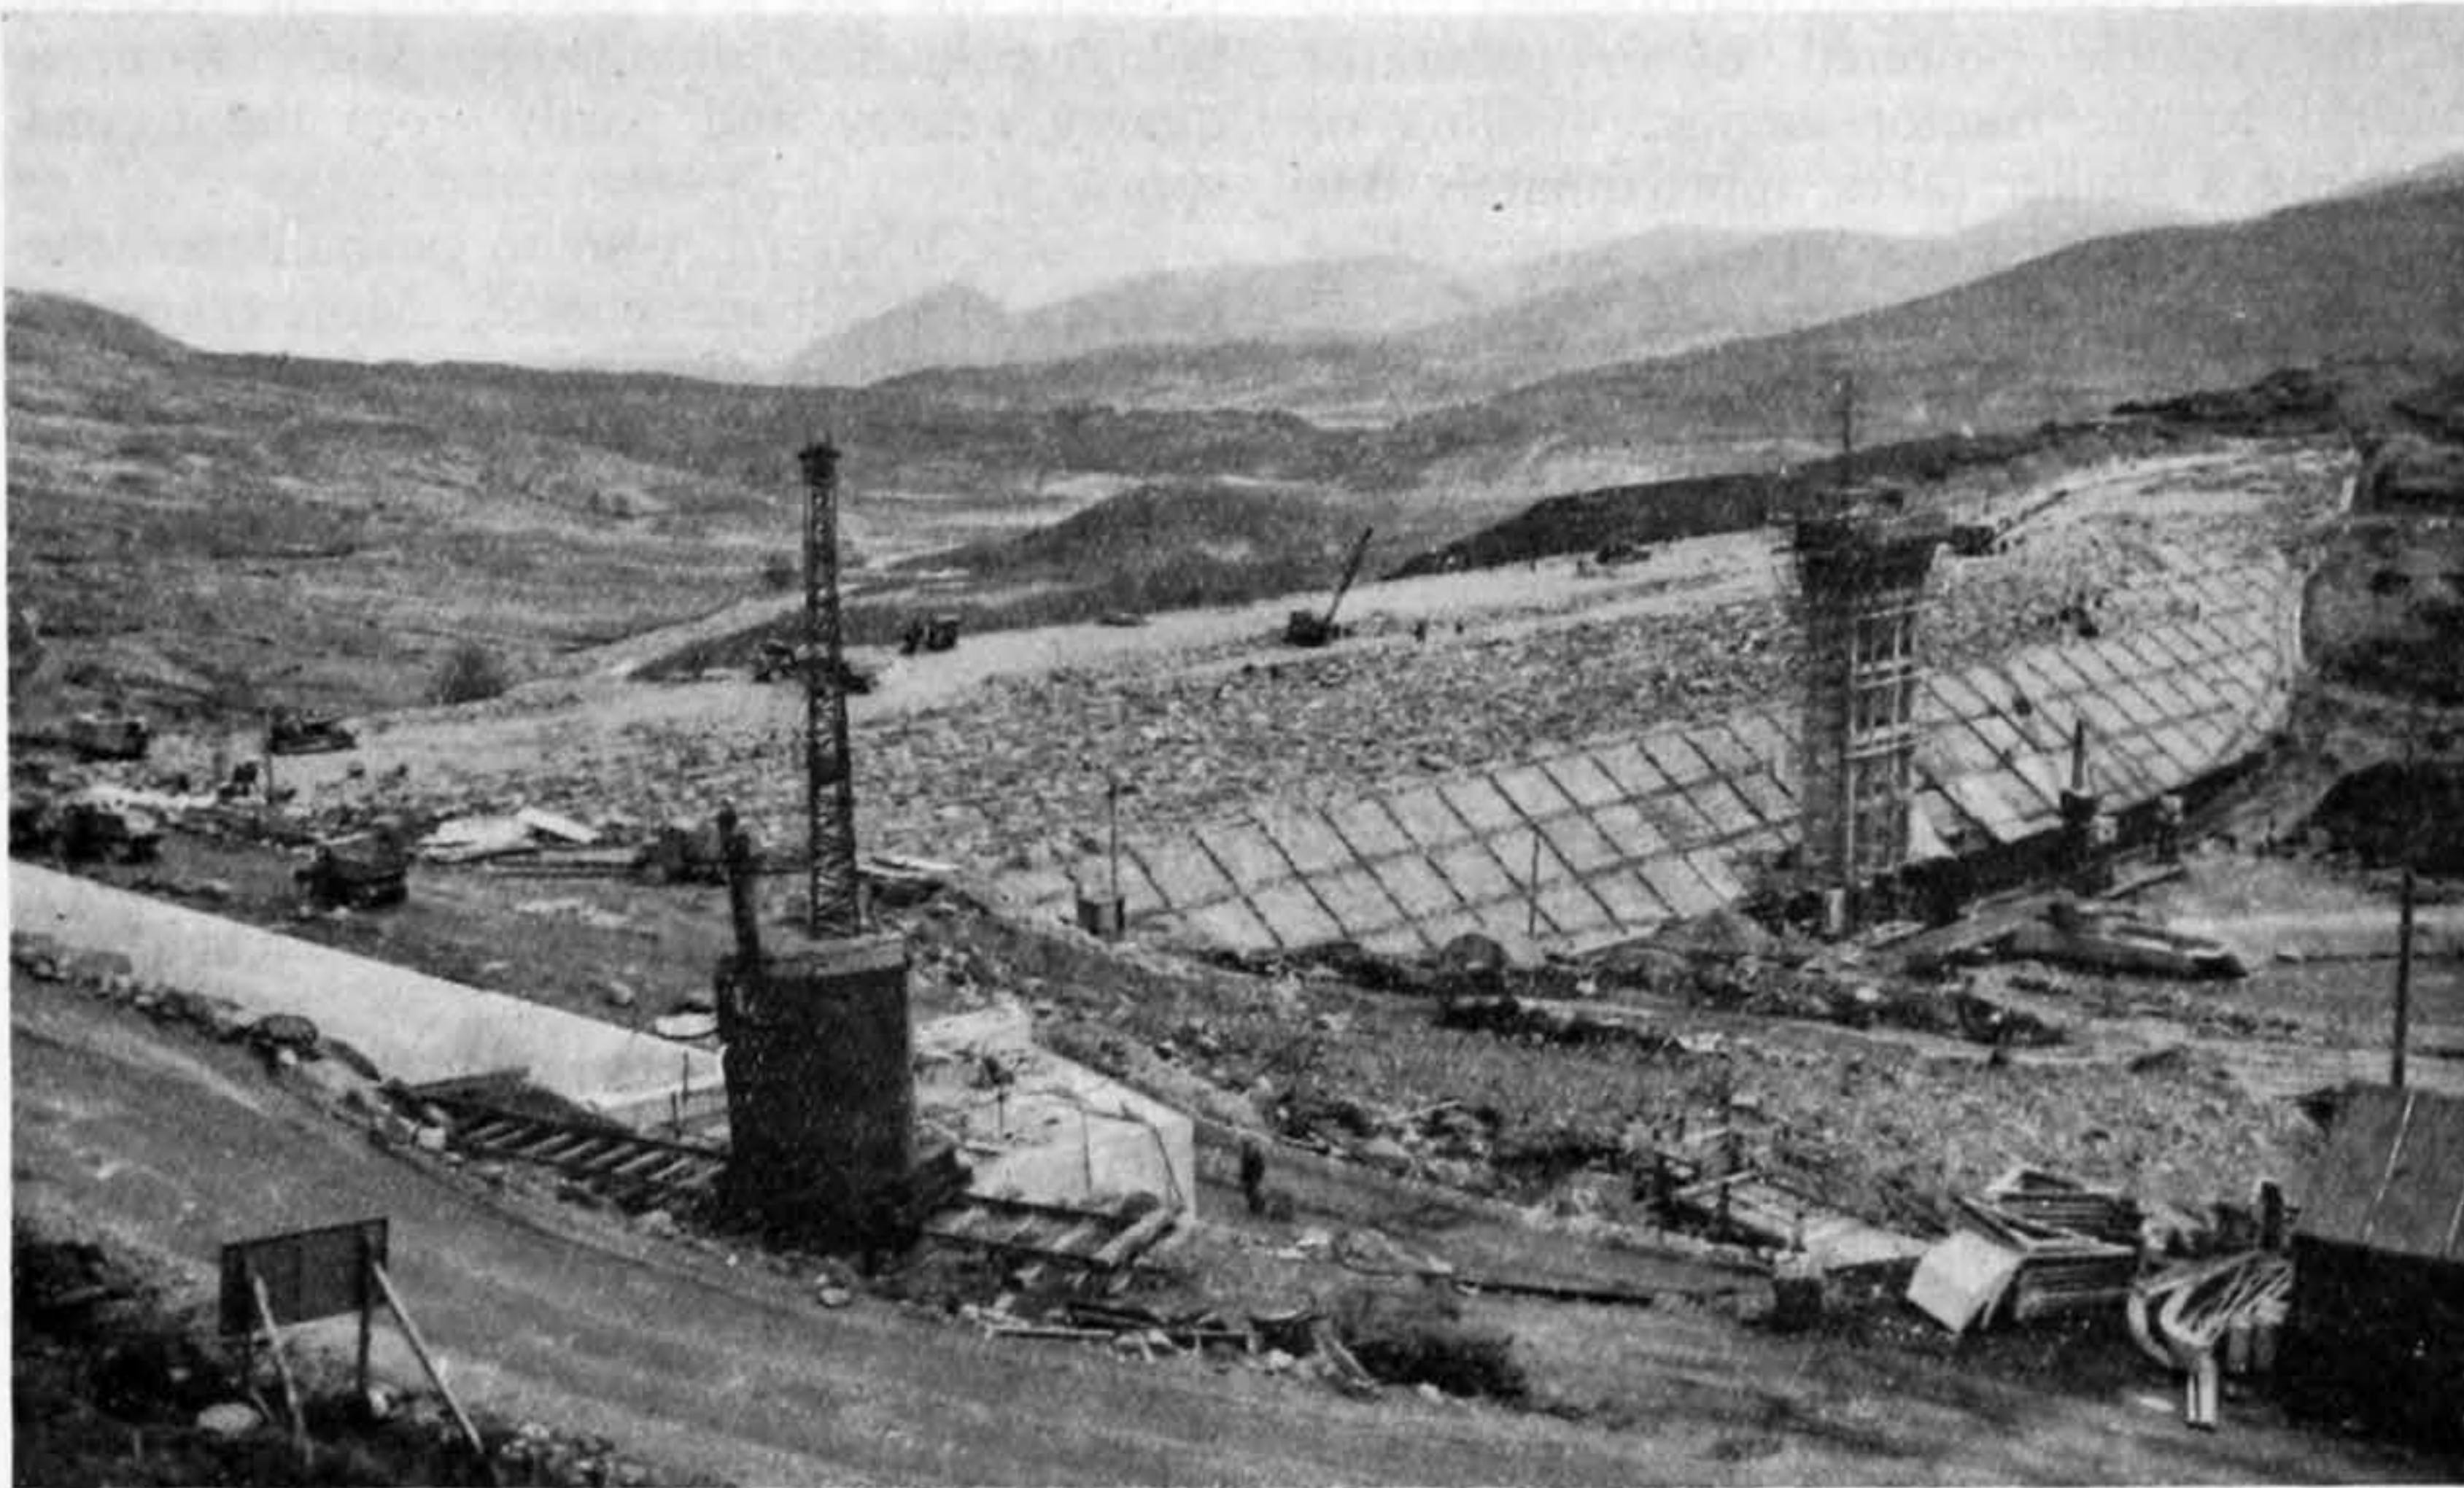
Quoich dam is here shown at an advanced stage of construction. Part of the upstream face has been prepared for the reinforced concrete beams and slabs comprising the sealing membrane, and the first slabs have been cast
